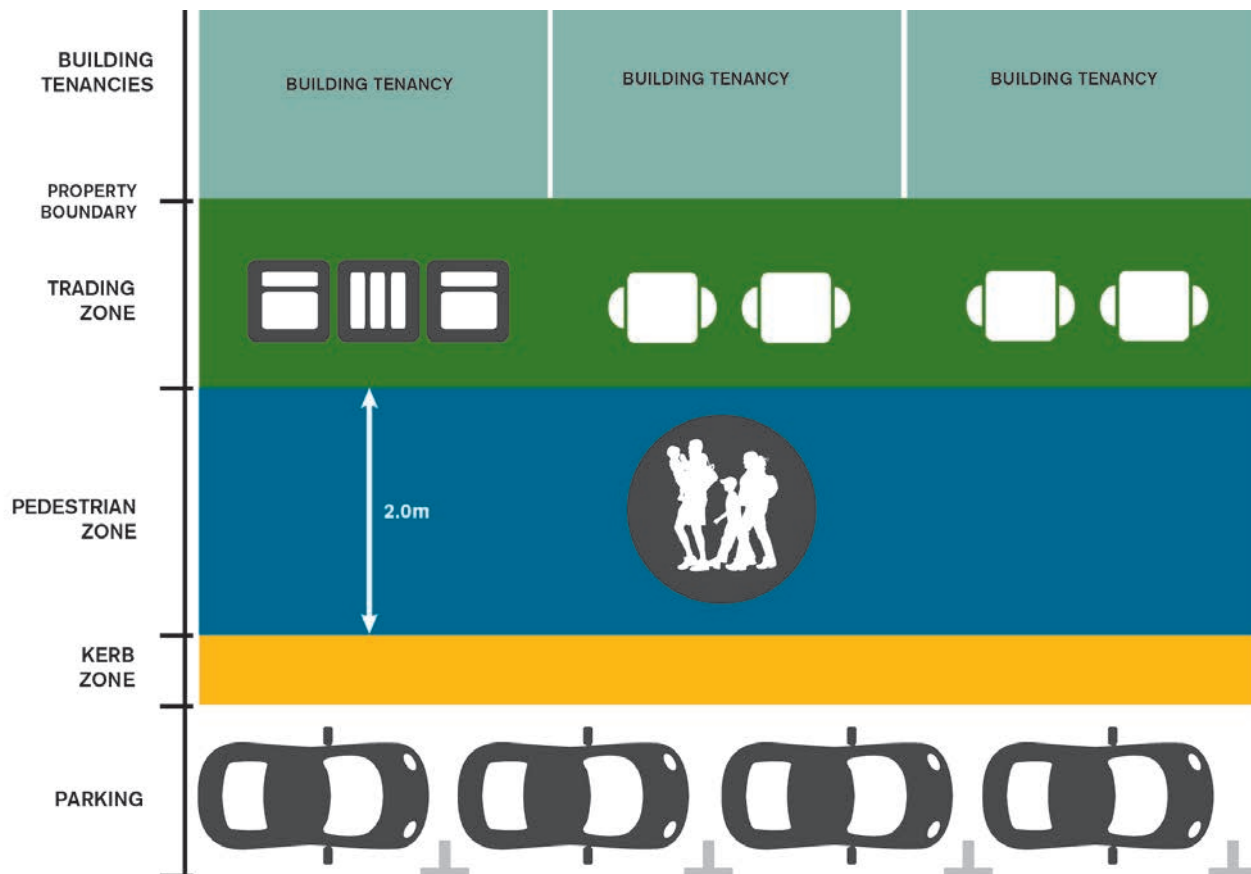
Alternative footpath zones arrangement - Trading Zone against the building and the Pedestrian Zone against the Kerb Zone
